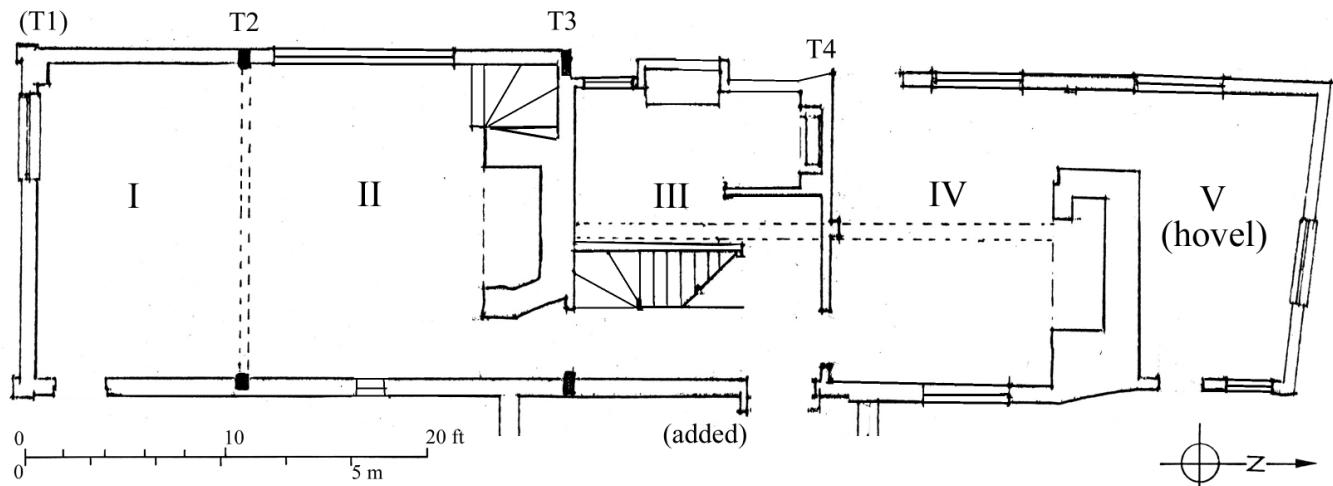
Plan, showing truss and bay numbering (redrawn from architect's plan).
